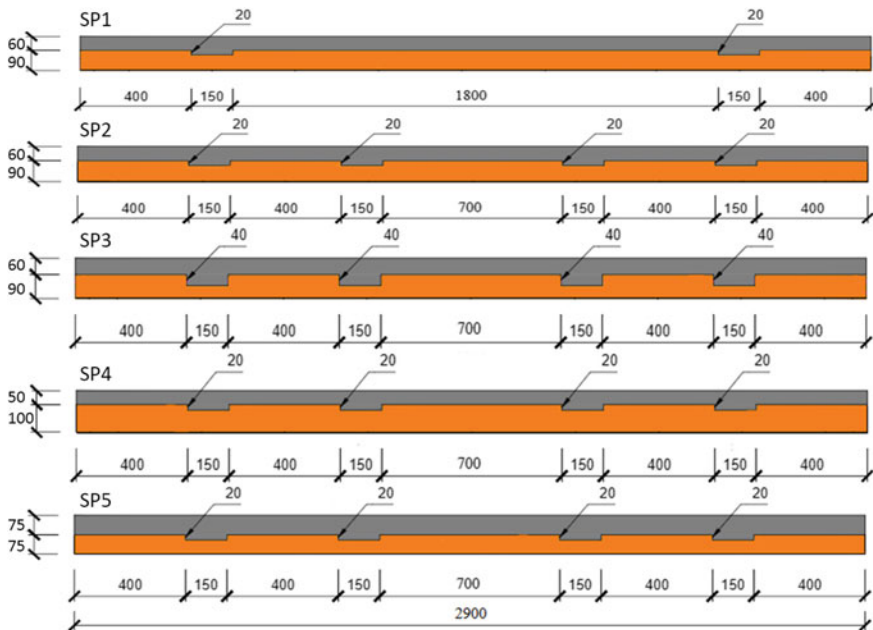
Composite floor specimen configurations (dimensions in mm)
